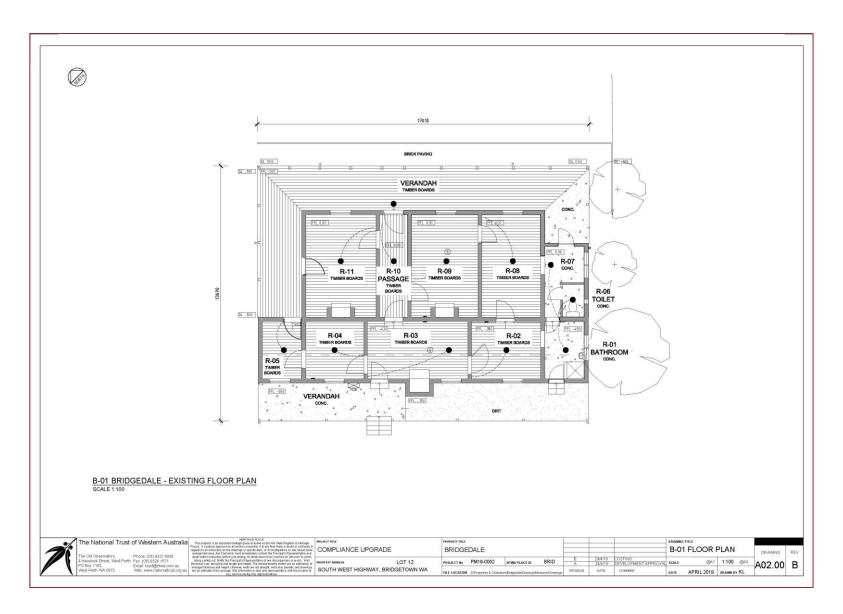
Existing Floor plan for Lot 12 South Western Highway, Bridgetown
